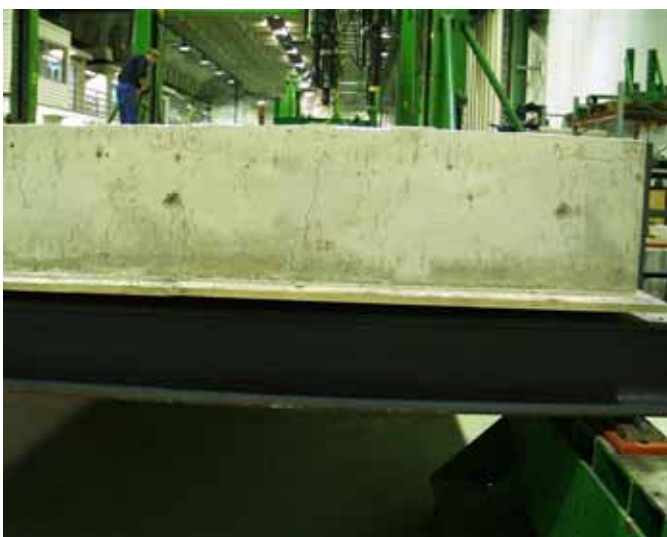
Cracks in Western tie beam after failure. Slabs 3-4.
